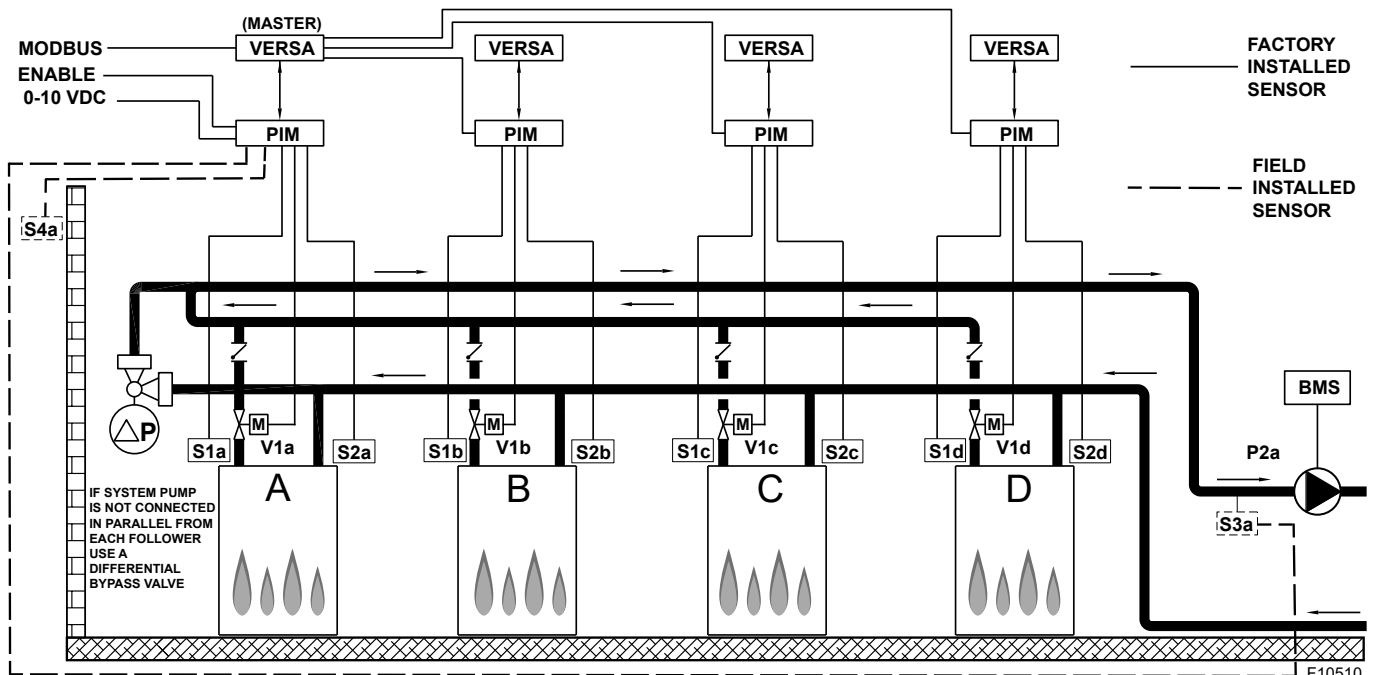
Boiler Cascade (can be up to 8 units) with Pressure Differential Bypass Valve - Primary Piping
